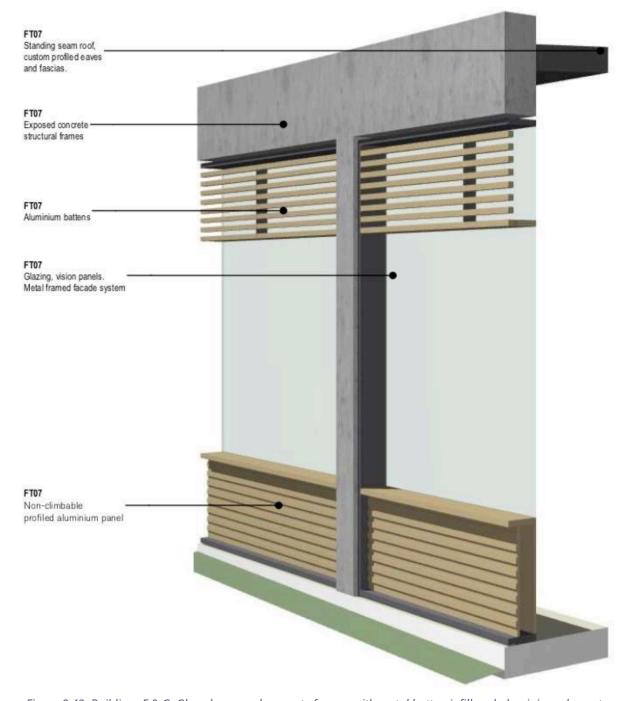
Buildings F & G. Glazed, exposed concrete frames with metal batten infill and aluminium elements (Source: FJMT, DA-5906, 18.12.19)
